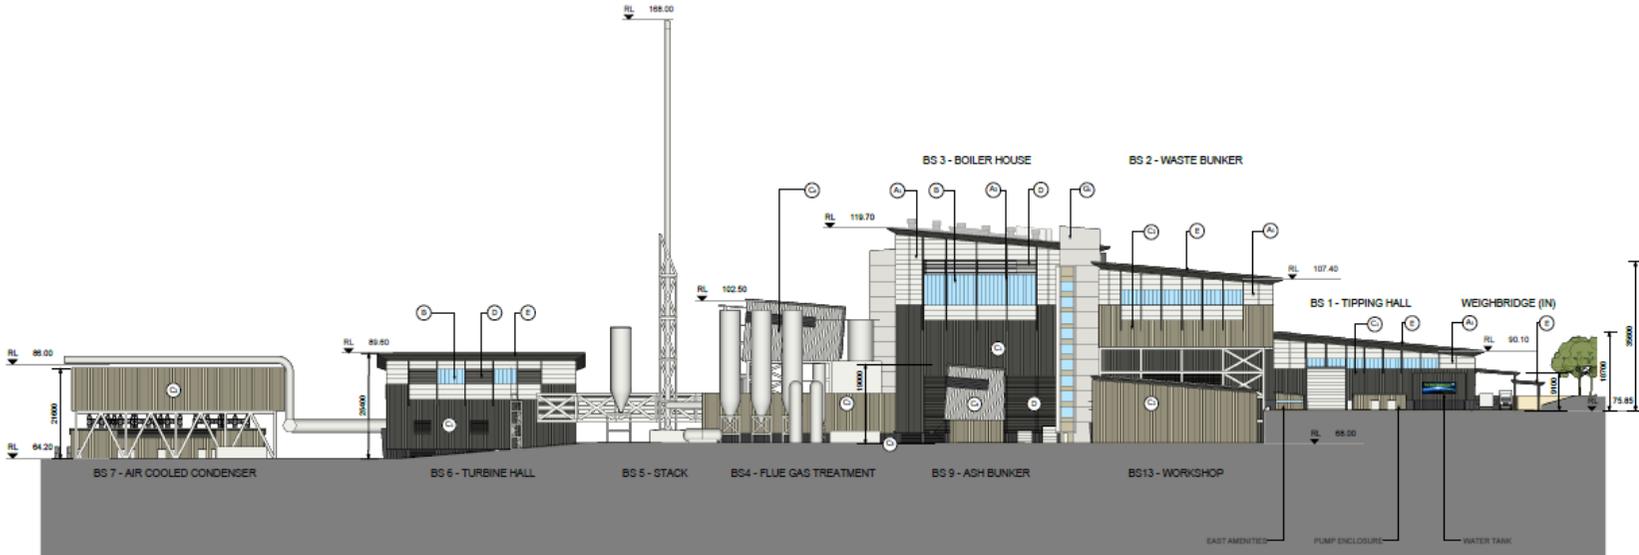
Southern Elevation (source: Krikis Taylor Architects, 2017)
